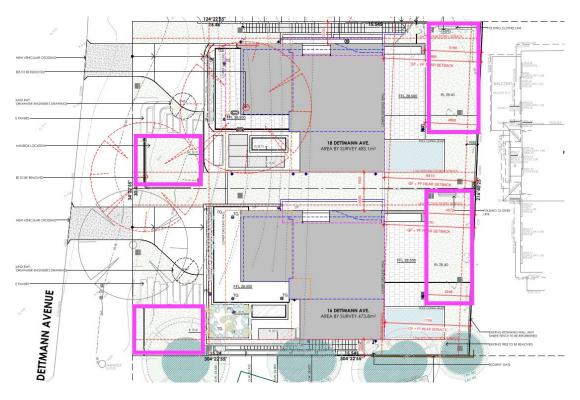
Landscape Calculation Areas (Source: Architectural Plans)
